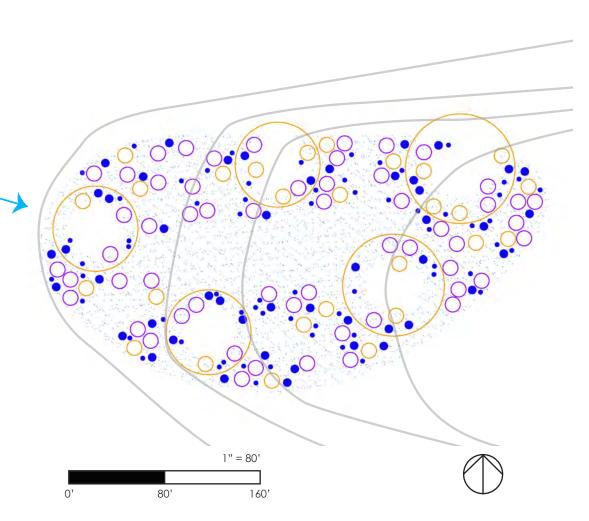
East Stadium Bioretention Planting Plan and Palette.
